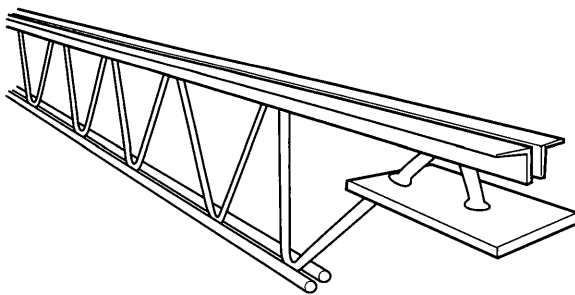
(b) Open-Web Bar Joist Construction.
